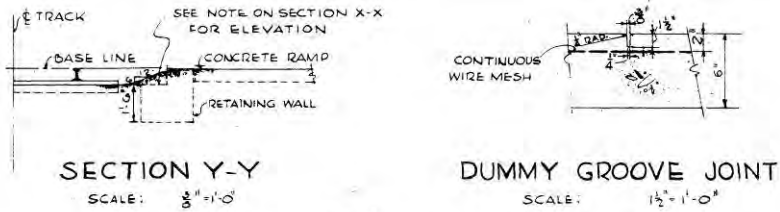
Rail movement mock-up, loading platform, end and side type P-3, Fort Bragg, NC, 1952 (standard drawing 28-13-100 sheet 4 of 4; rail movement mock-up, loading platform, end and side type P3; 11 April 1952).
